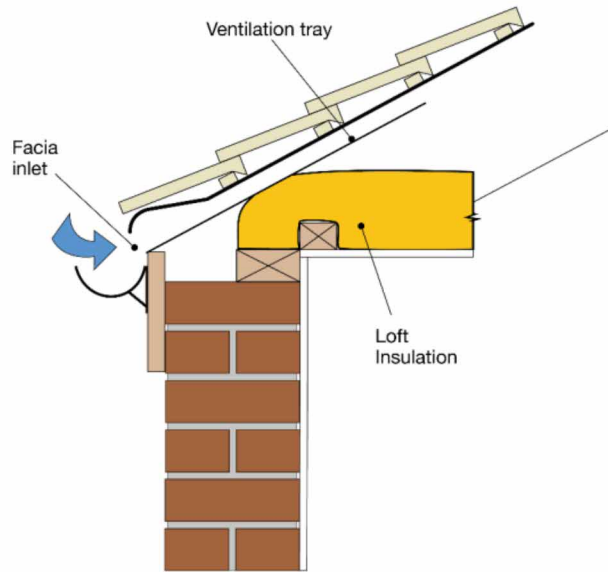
Standard Eaves Detail on a cavity wall construction without external wall insulation (EWI)
